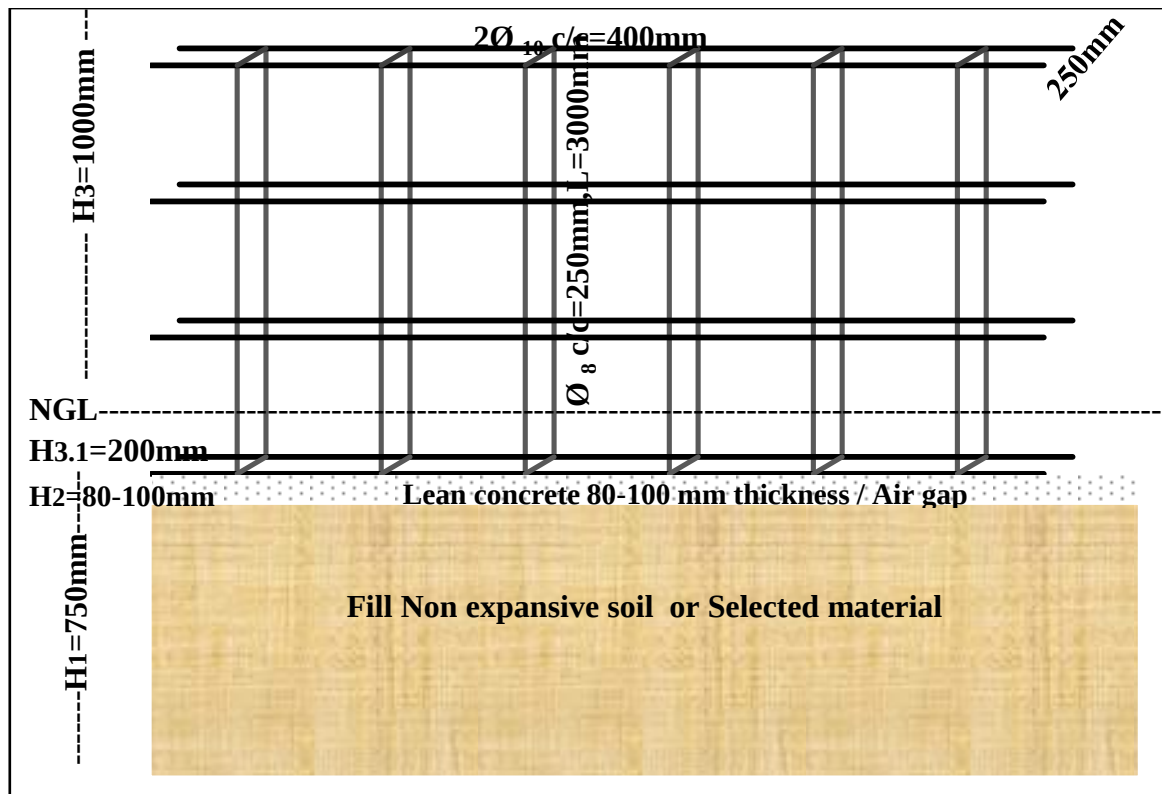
17: Recommended foundation and detail drawings for G+0 buildings
